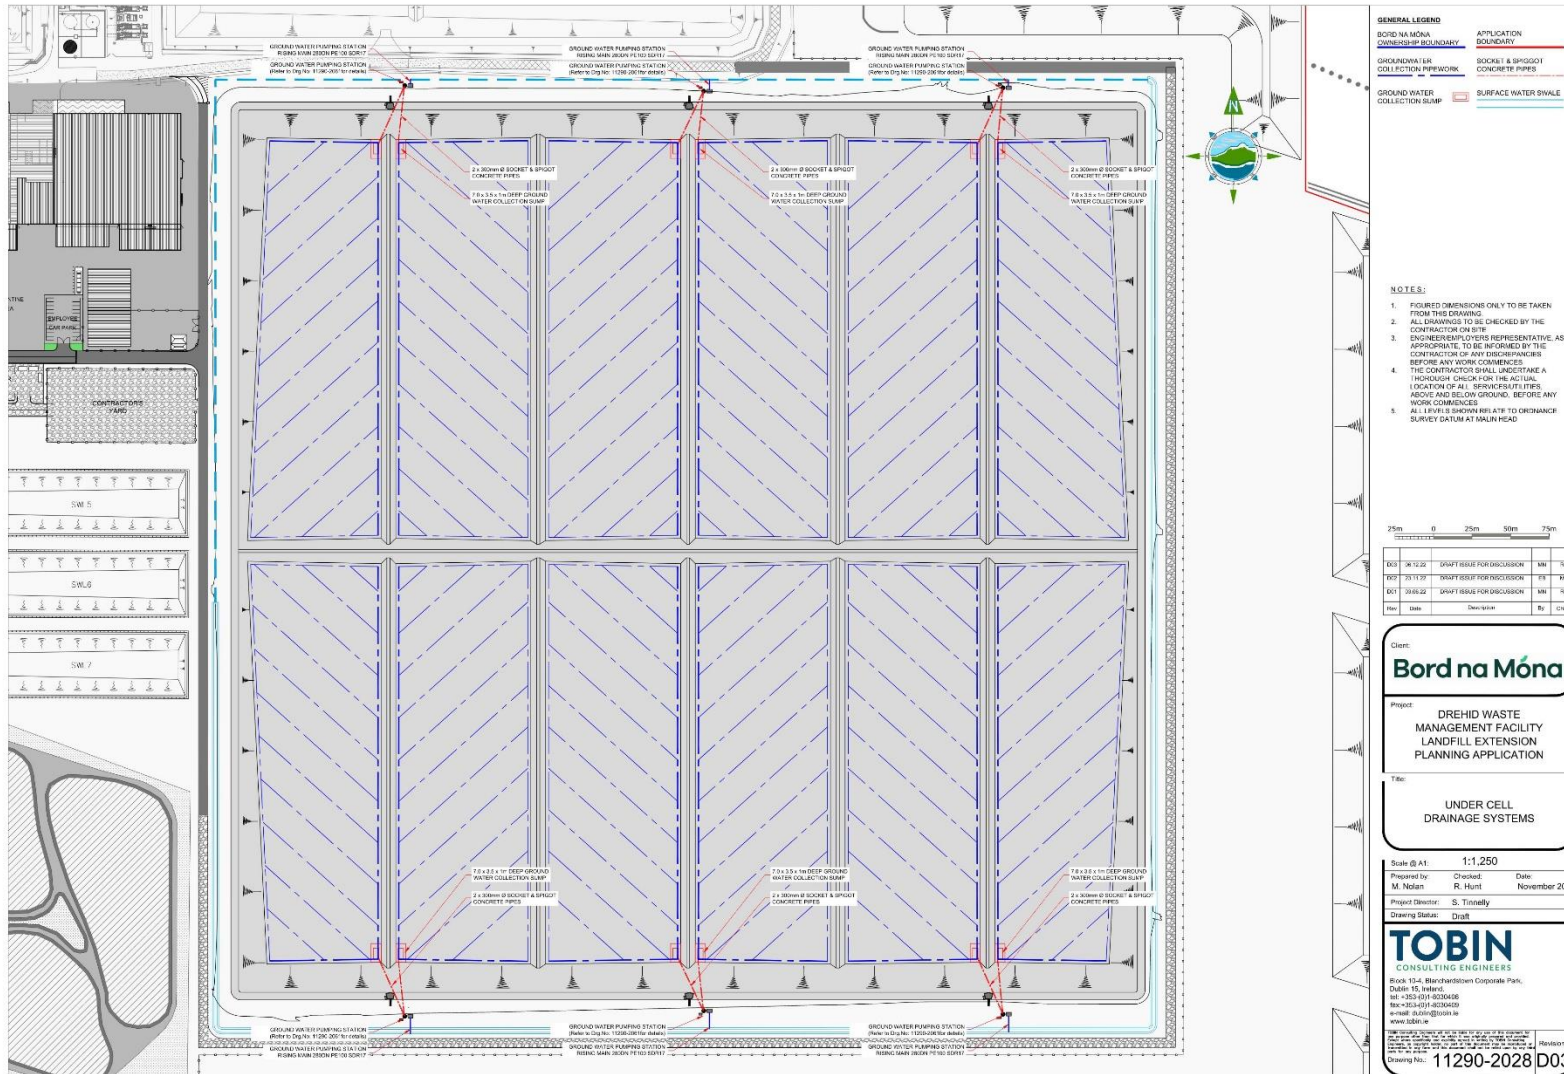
Layout of Under-cell Drainage System Beneath New Waste Cells
